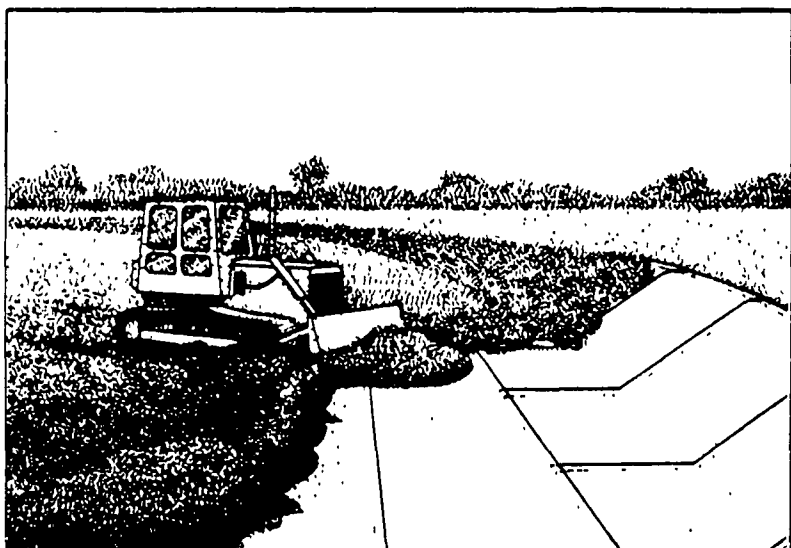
inch overlap; all soil must be removed from the overlap area of the liner to ensure a monolithic seal.
